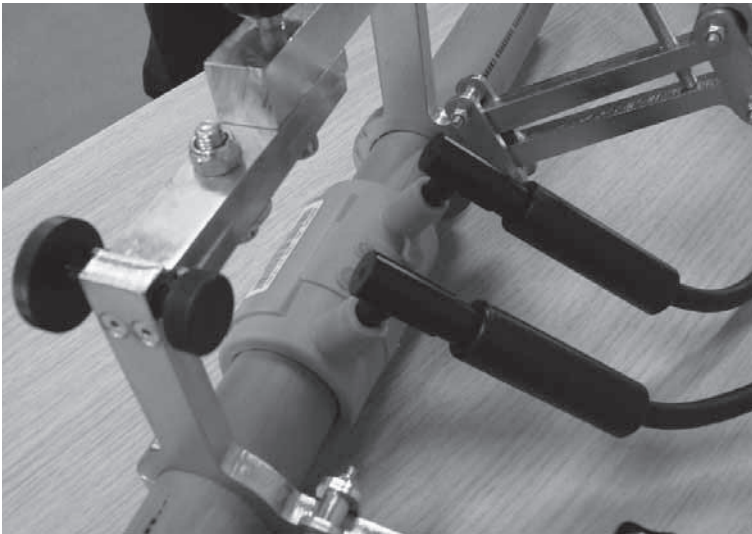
Plug in the cable plugs in the contact bushings of a suitable electrofusion machine.
